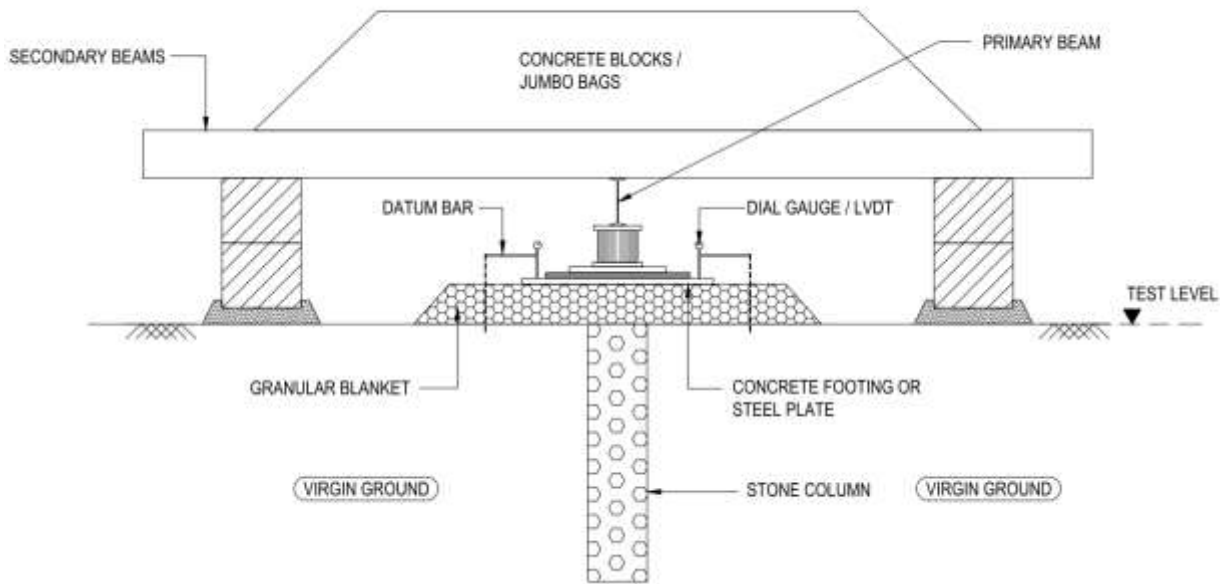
TYPICAL ARRANGEMENT FOR A SINGLE COLUMN TEST
